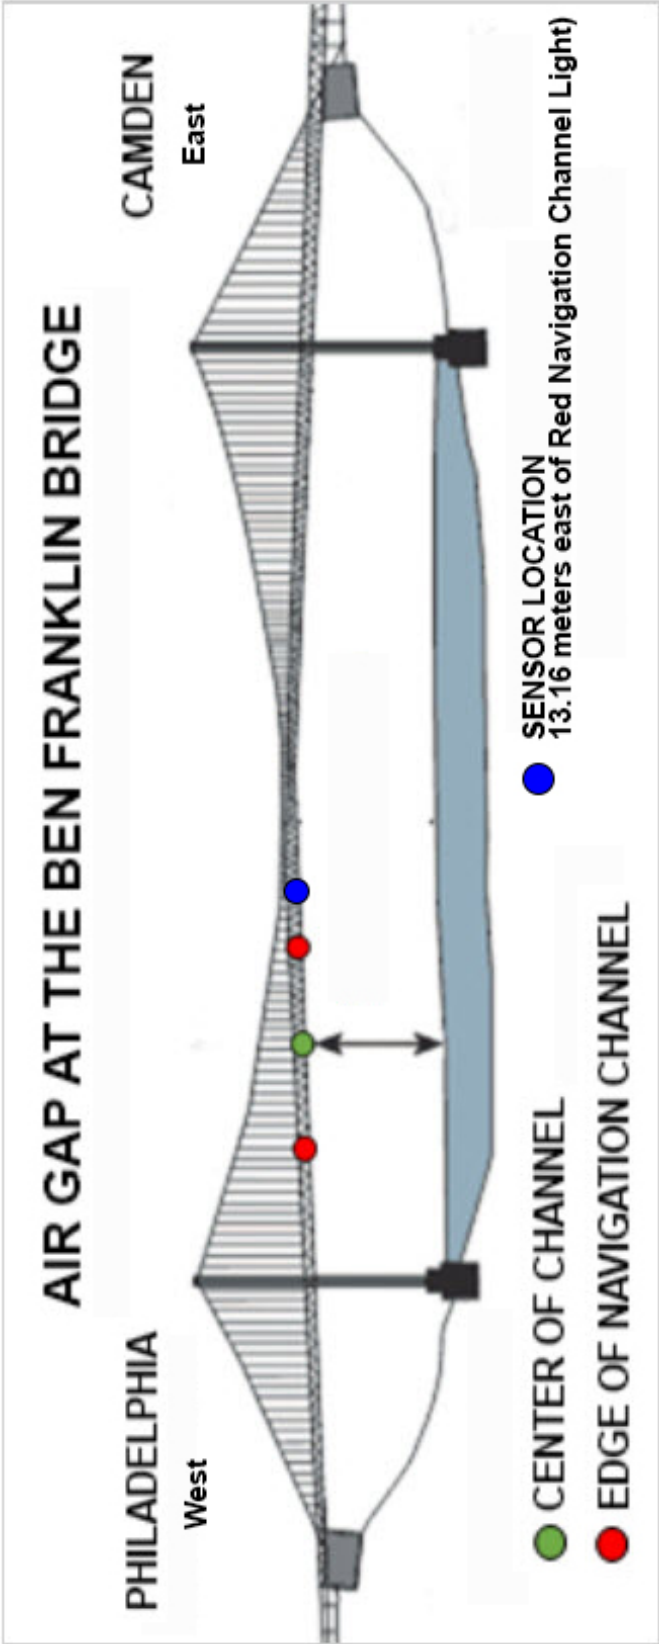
Schematic of the Air Gap Sensor Elevation Offset at the Ben Franklin Bridge.
